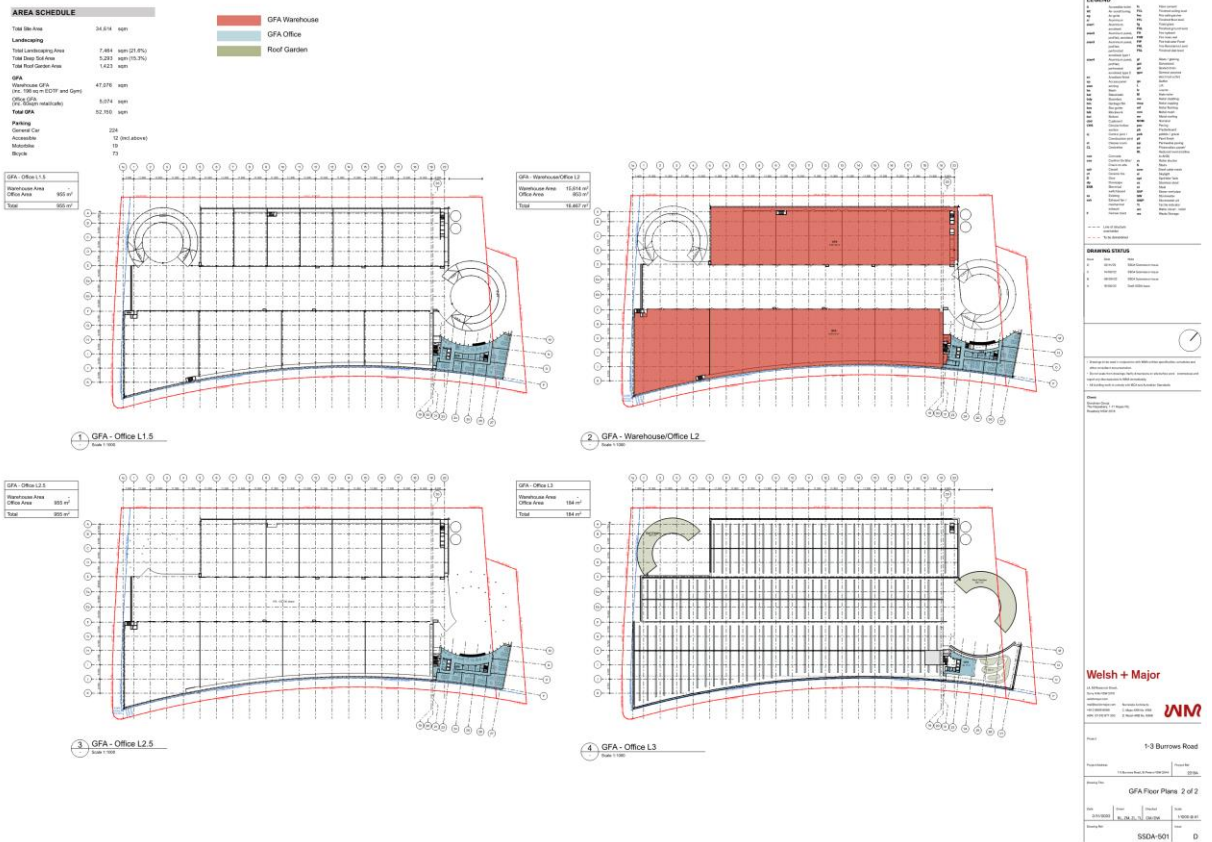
Proposed Development – GFA Floor Plans Sheet 2
